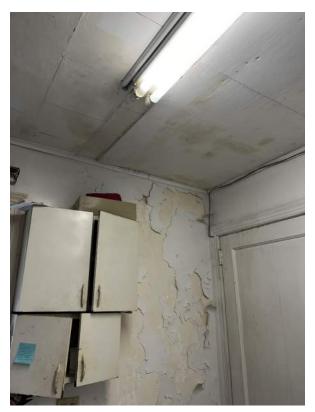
IMG_1182 - Interior 1st Floor, Northwest corner of Prep Room – significant water damage for full height of interior corner and ceiling.
